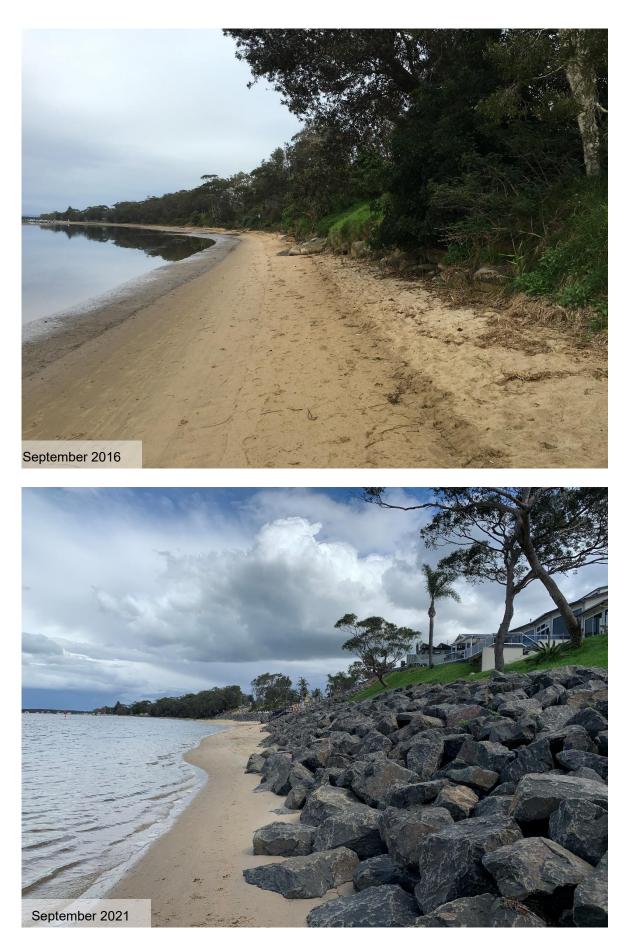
Eastern end section of rock revetment, at Ch 700 m looking west
